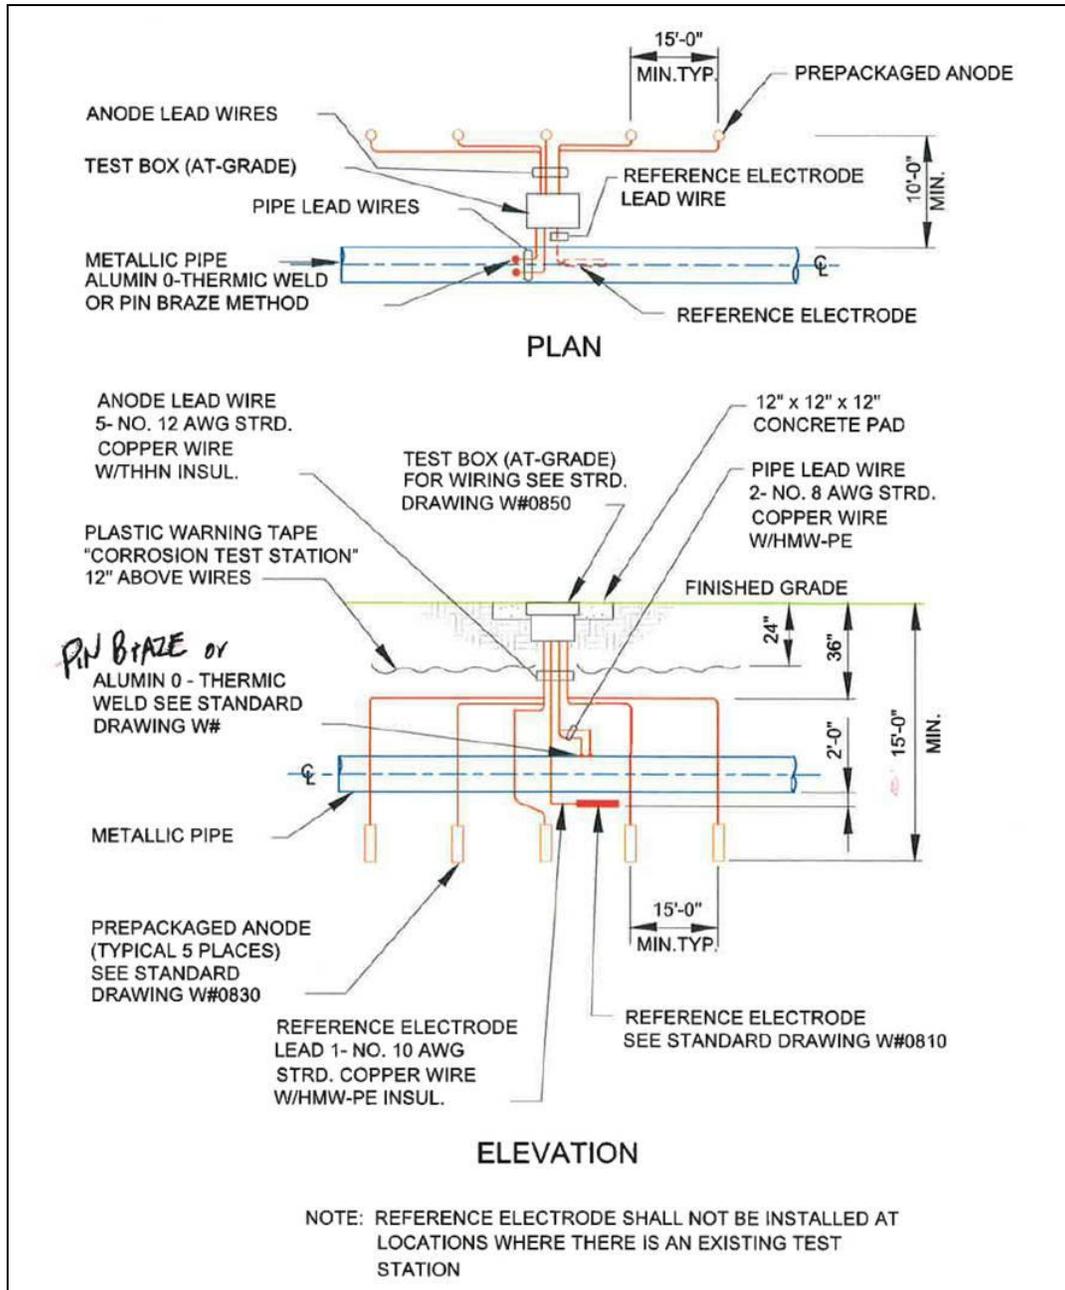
ANODE TEST STATION INSTALLATION DETAIL
